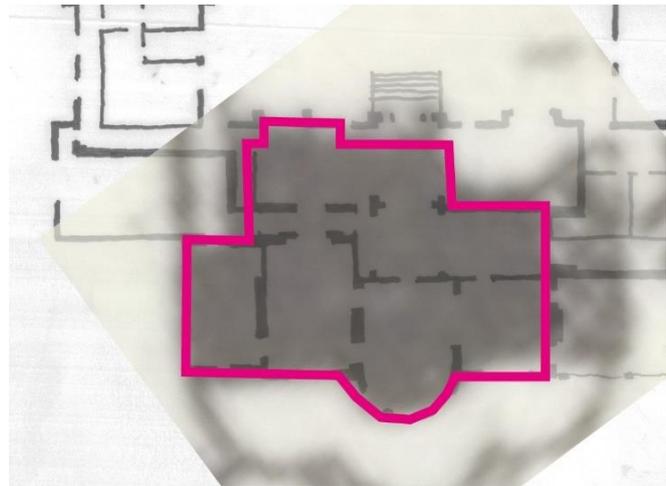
1888 Ordnance Survey map overlaid with existing ground plan
